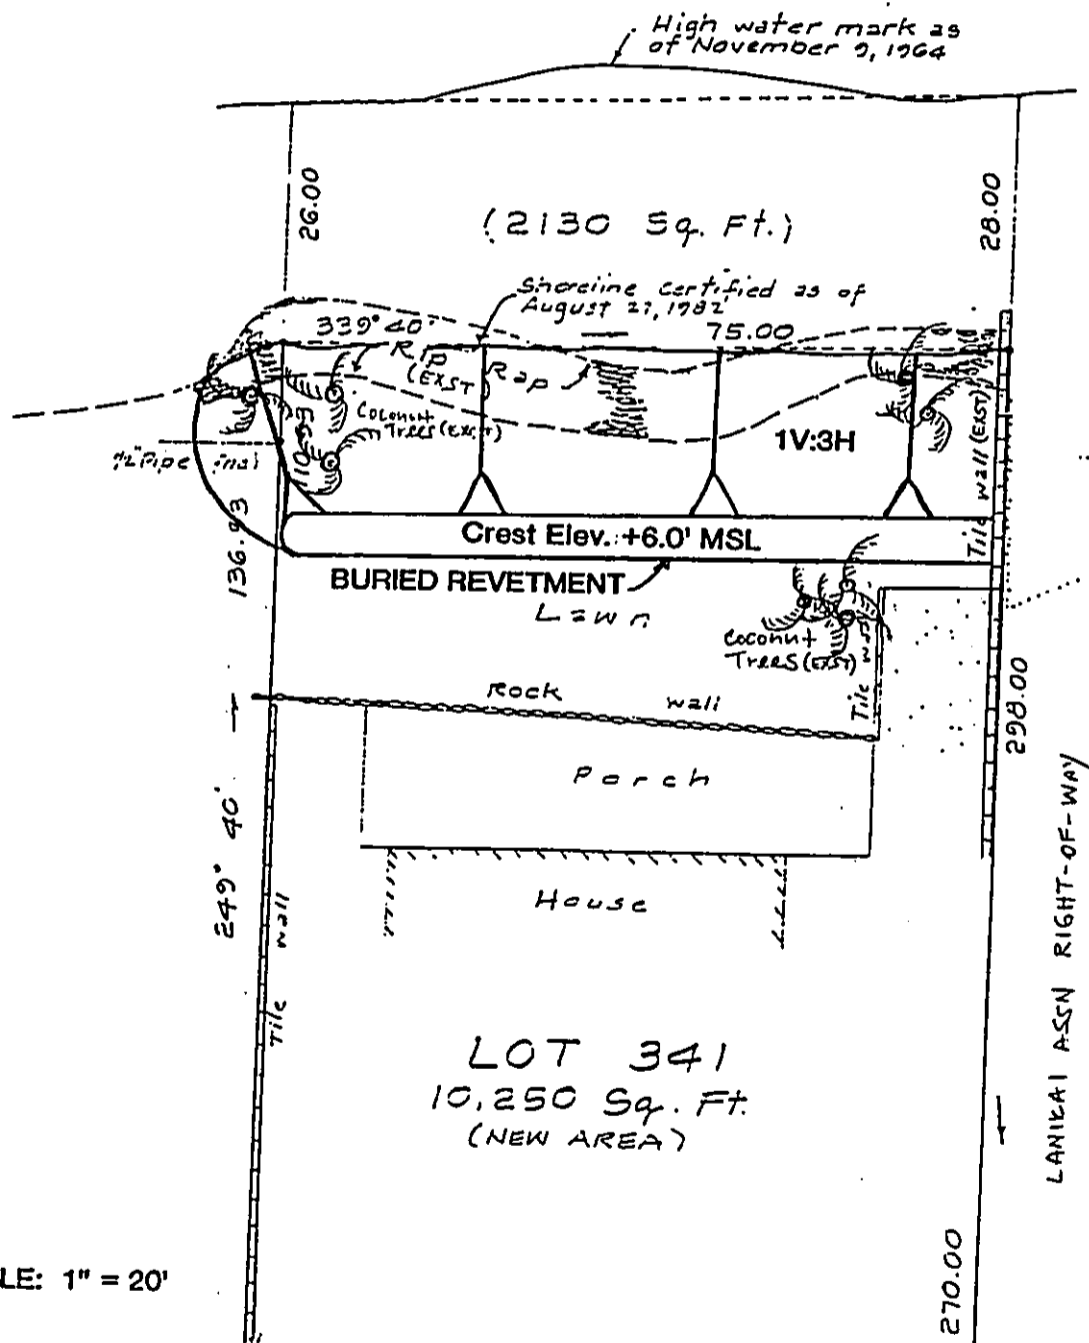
PROPOSED REVETMENT LAYOUT PLAN
